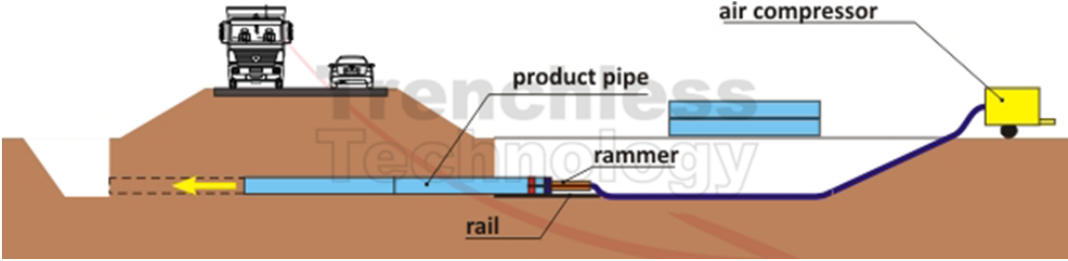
Pipe ramming. (Source: www.TRENCHLESS.EU)
